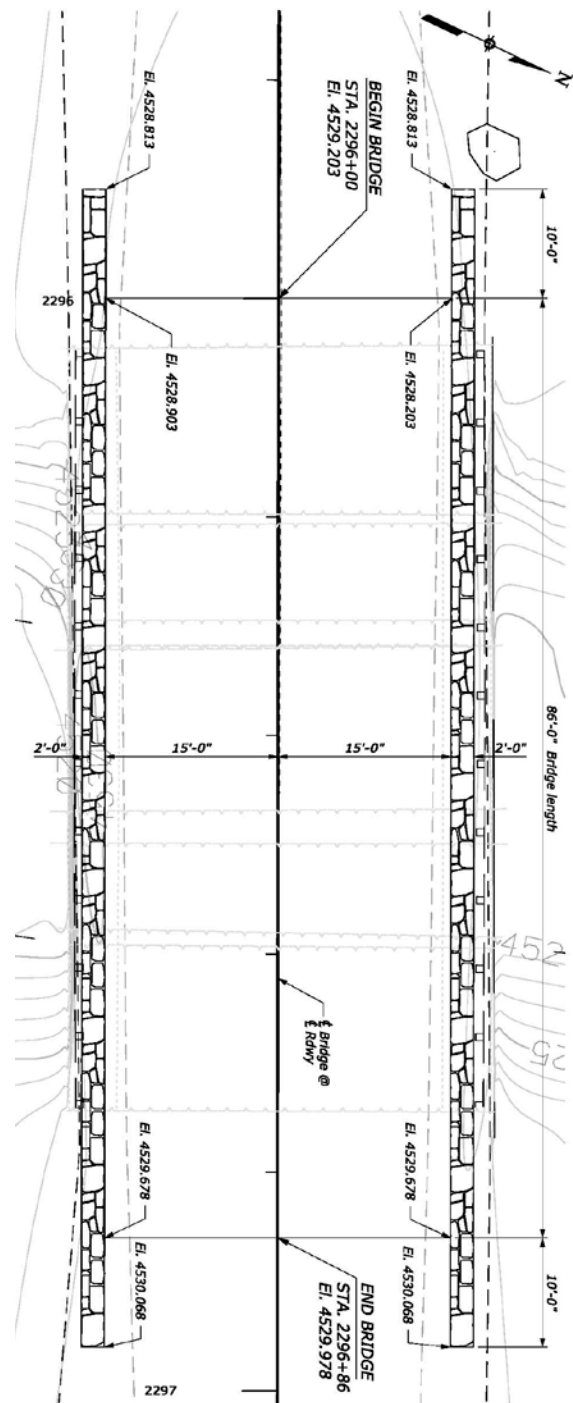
Preliminary design layout for the new Rose Creek Bridge; grade diagram.
